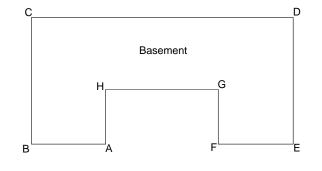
Plan view of a basement with two inside corners, G and H, and six outside corners, A, B, C, D, E and F
